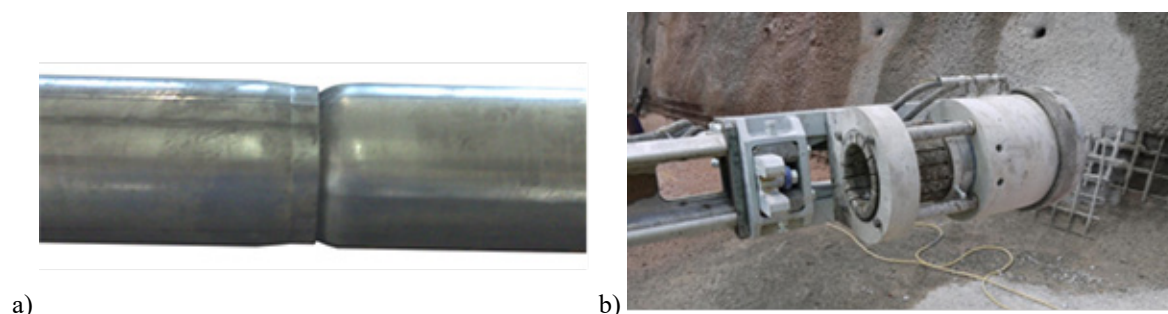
a) squeezed connection and b) squeezing console mounted on a drill boom.
